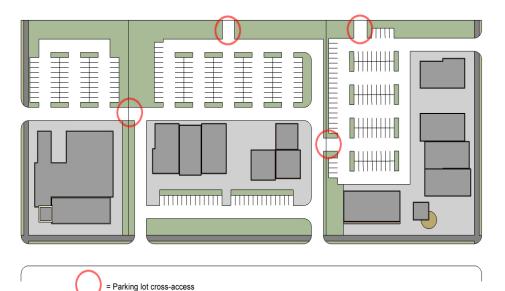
C.2.c.2(a) : Example of Vehicular Parking Area Cross Access
